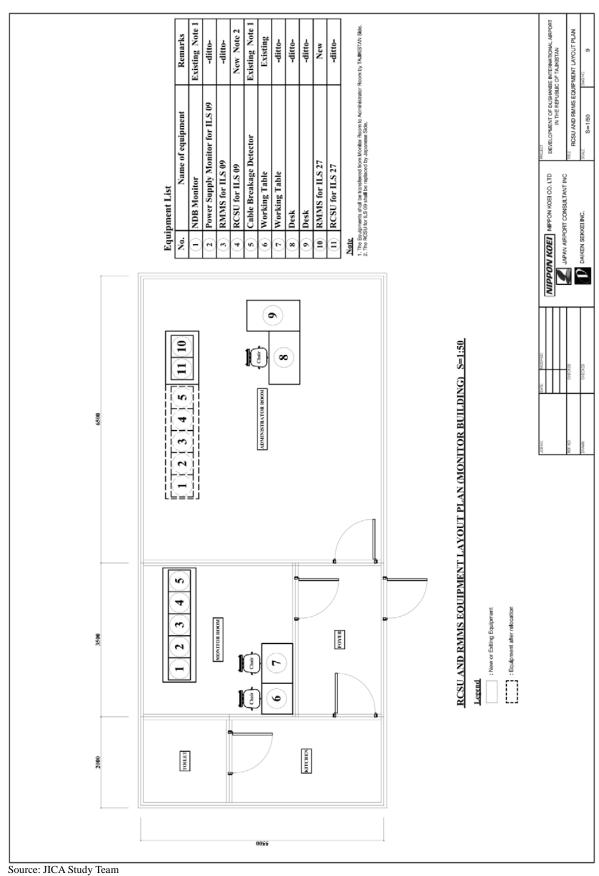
RCSU and RMMS Equipment Layout Plan
